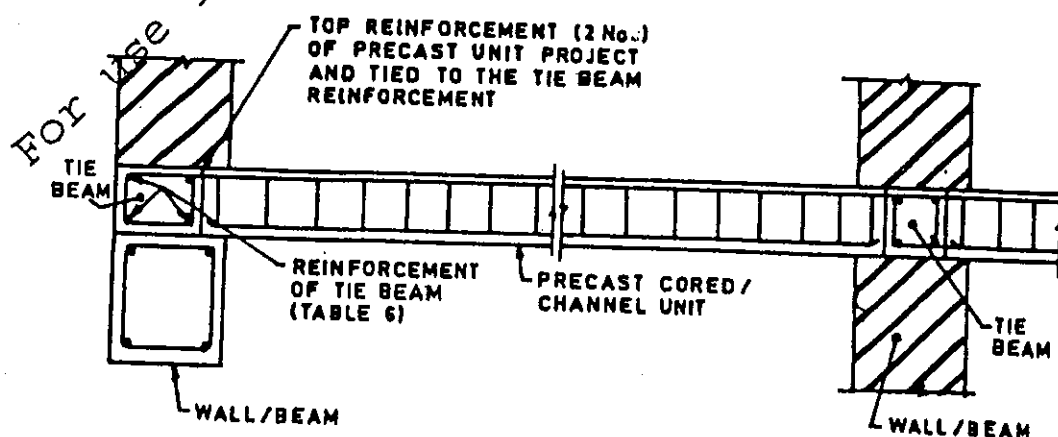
CONNECTION OF PRECAST CORED/CHANNEL UNIT WITH TIE BEAM
